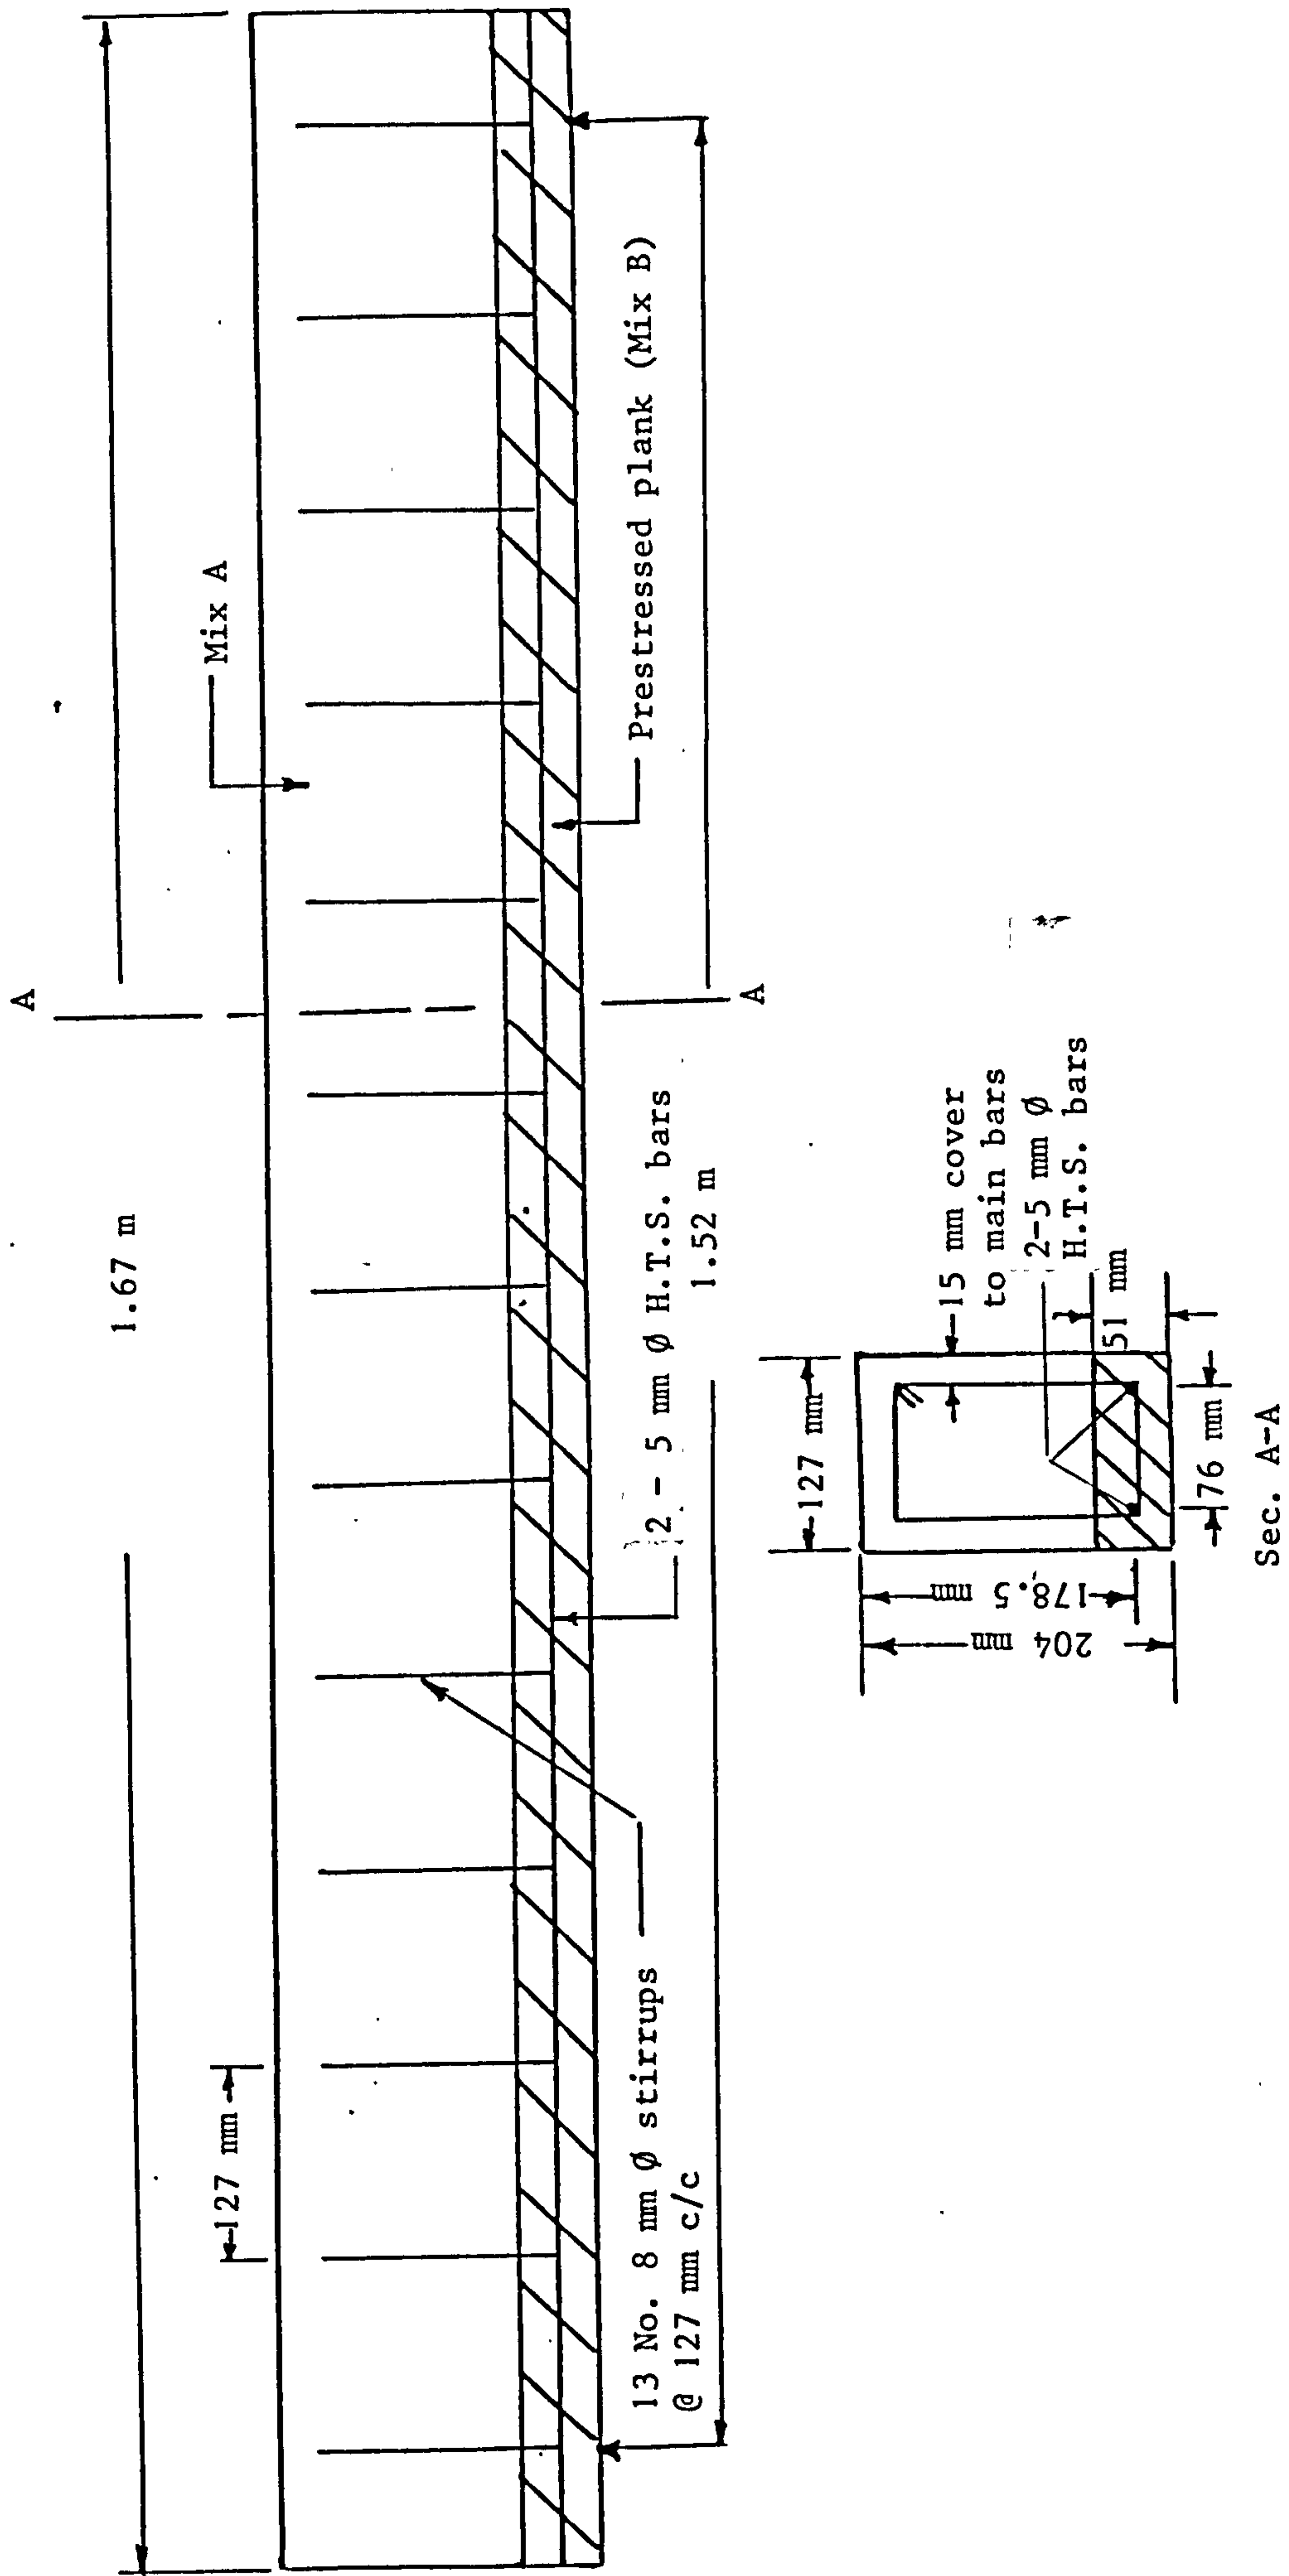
Diagram showing reinforcement in composite prestressed concrete simple beam
